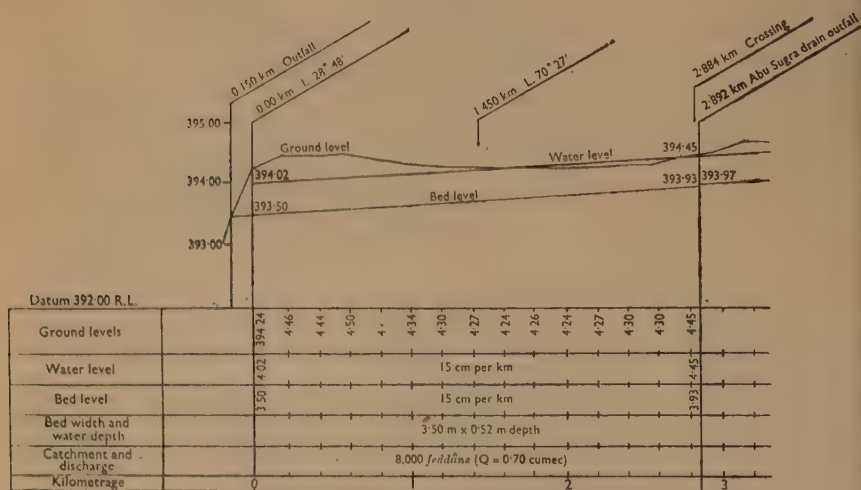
DRAIN: PART LONGITUDINAL SECTION
